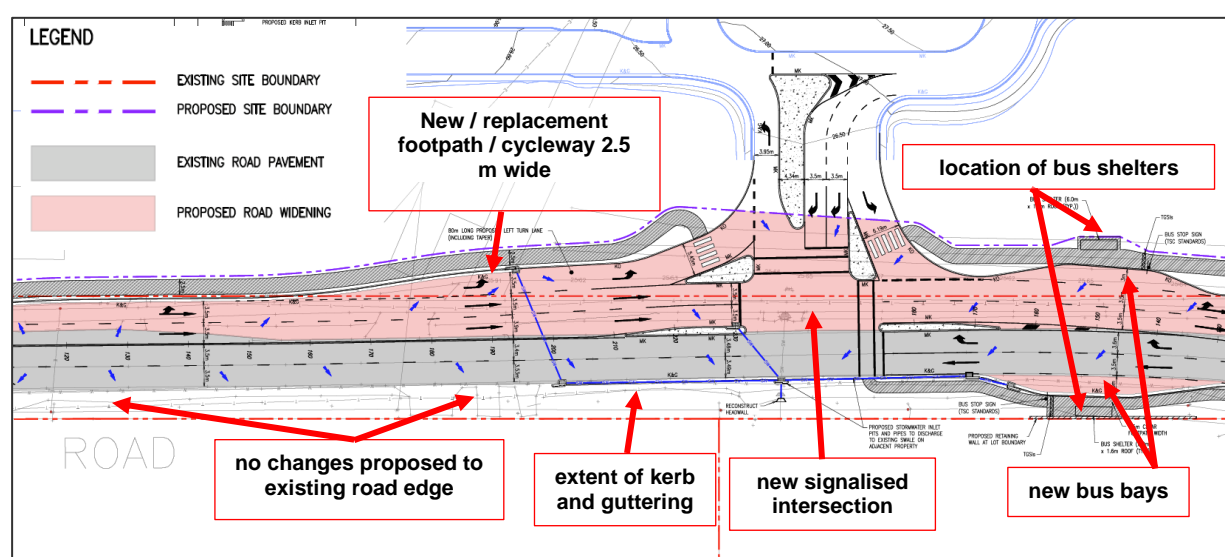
| Signalised intersection on Cudgen Road (Access B) (Source: Applicant's RTS)
